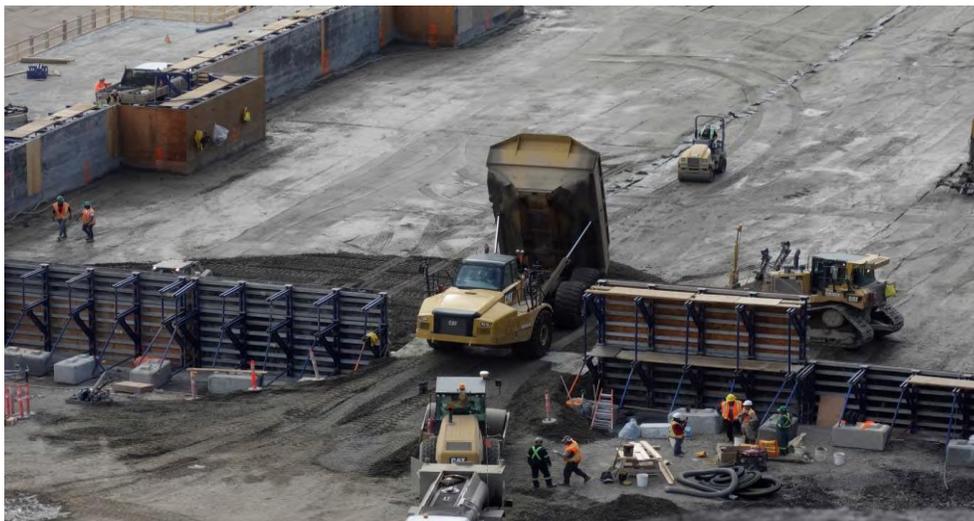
Overview of the Powerhouse Buttress, Service Bay Pad, Tailrace Wall, and Generating Station & Spillways Laydown Areas. Photo taken July 5, 2018.
